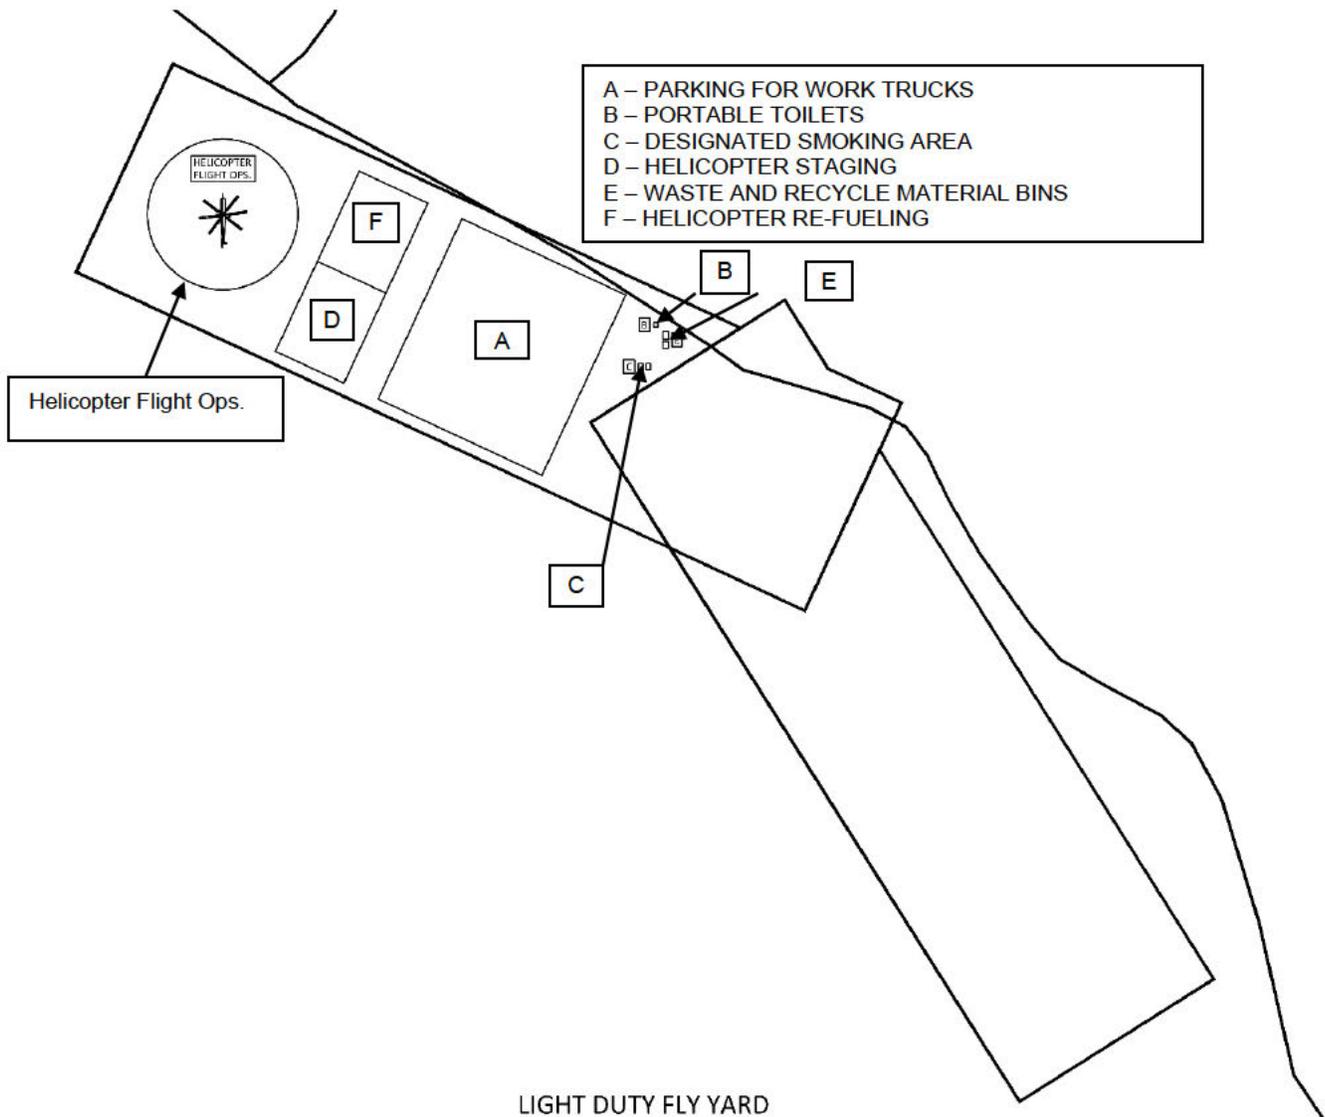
Light-Duty Fly Yard on Pulling and Tensioning Site Layout
